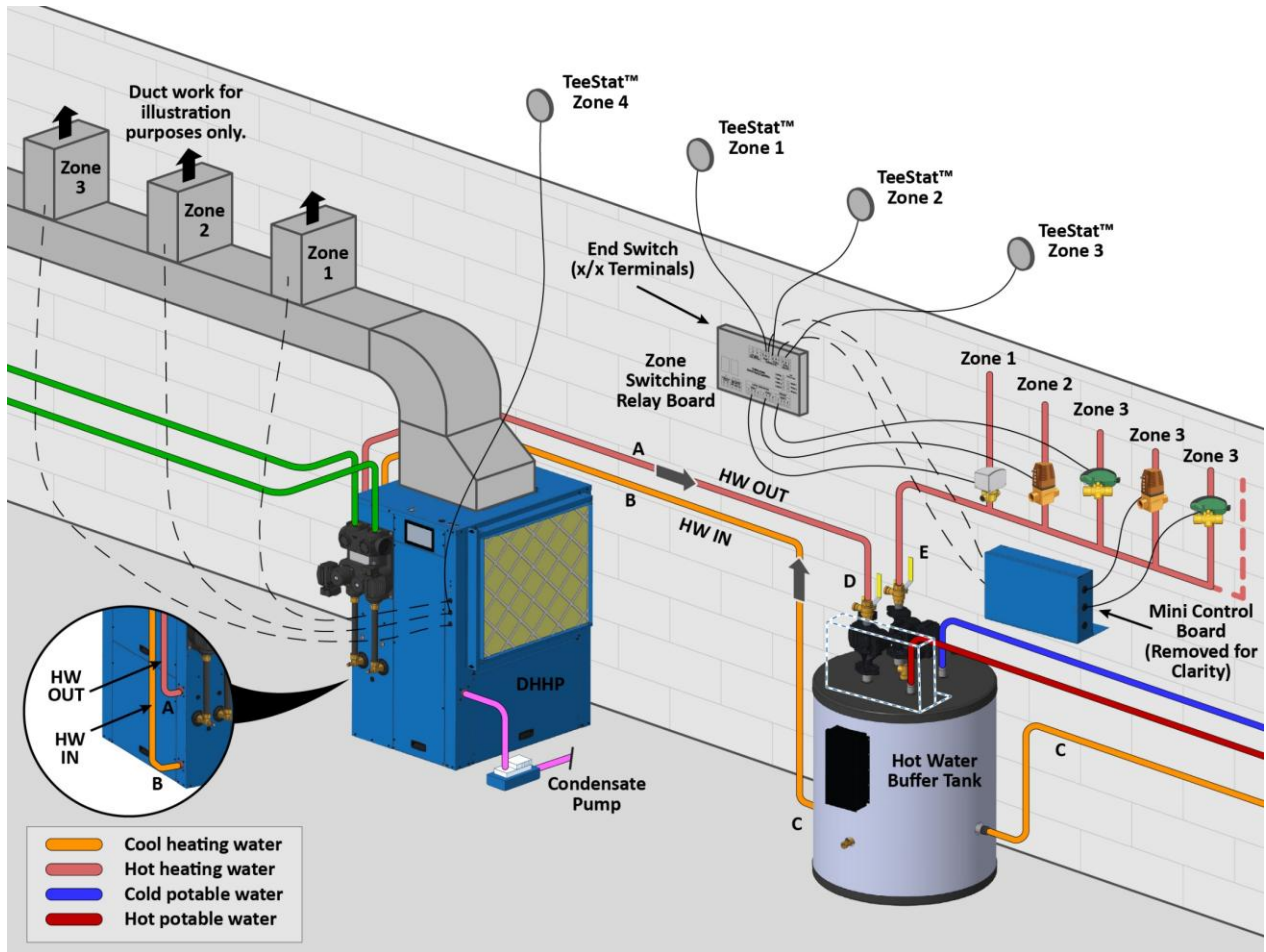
Multi-zone Hybrid configuration with zone valves (makeup assembly not shown)
